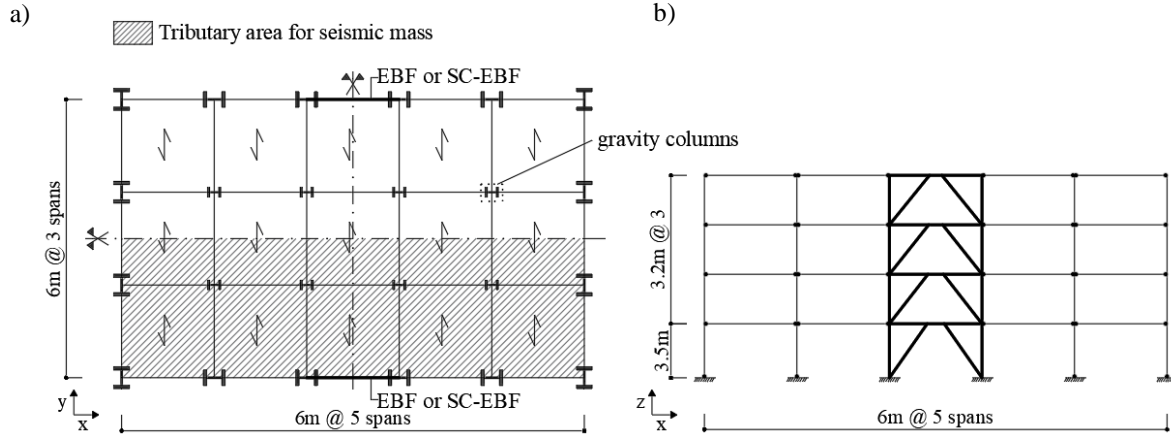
(a) Plan view and (b) Elevation view of the case-study building with EBF.
